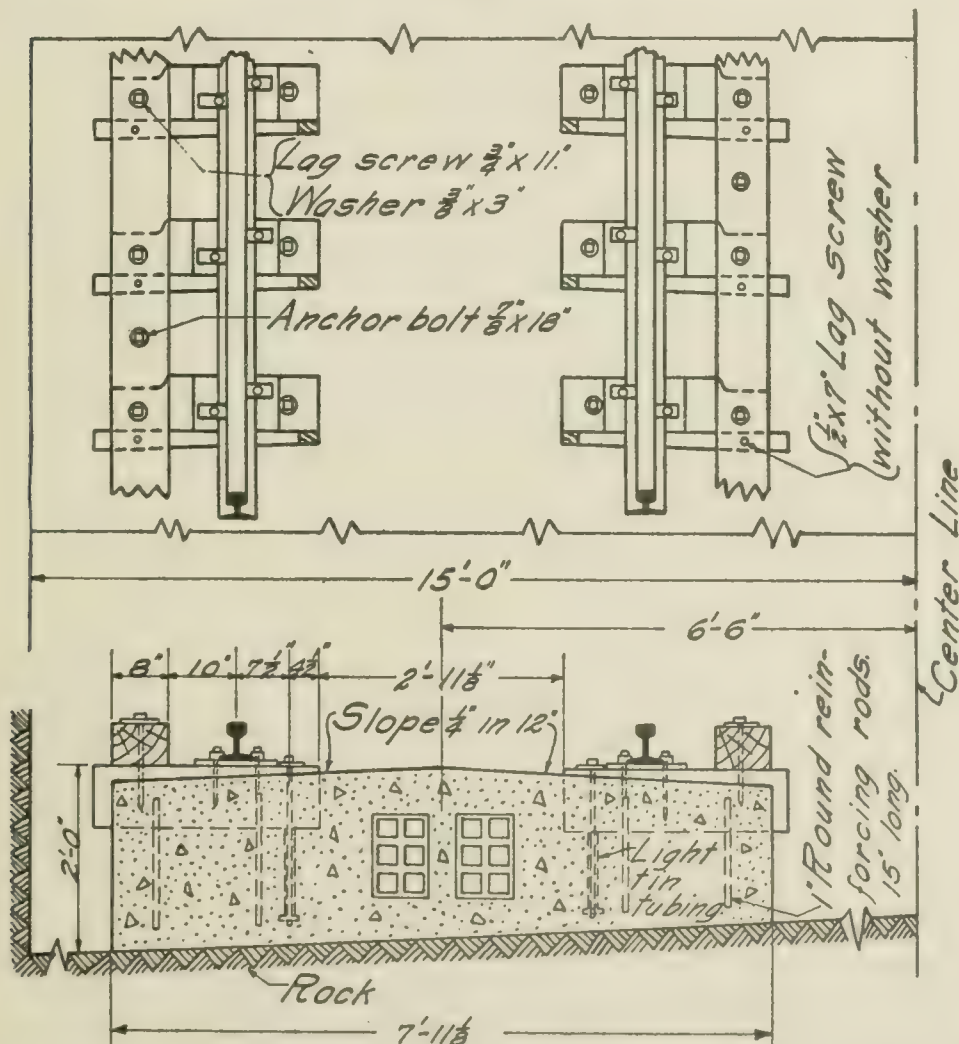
CONCRETE TRACK CONSTRUCTION PROPOSED BY LINCOLN BUSH AND USED IN BERGEN HILL TUNNEL, D., L. & W. R. R.
